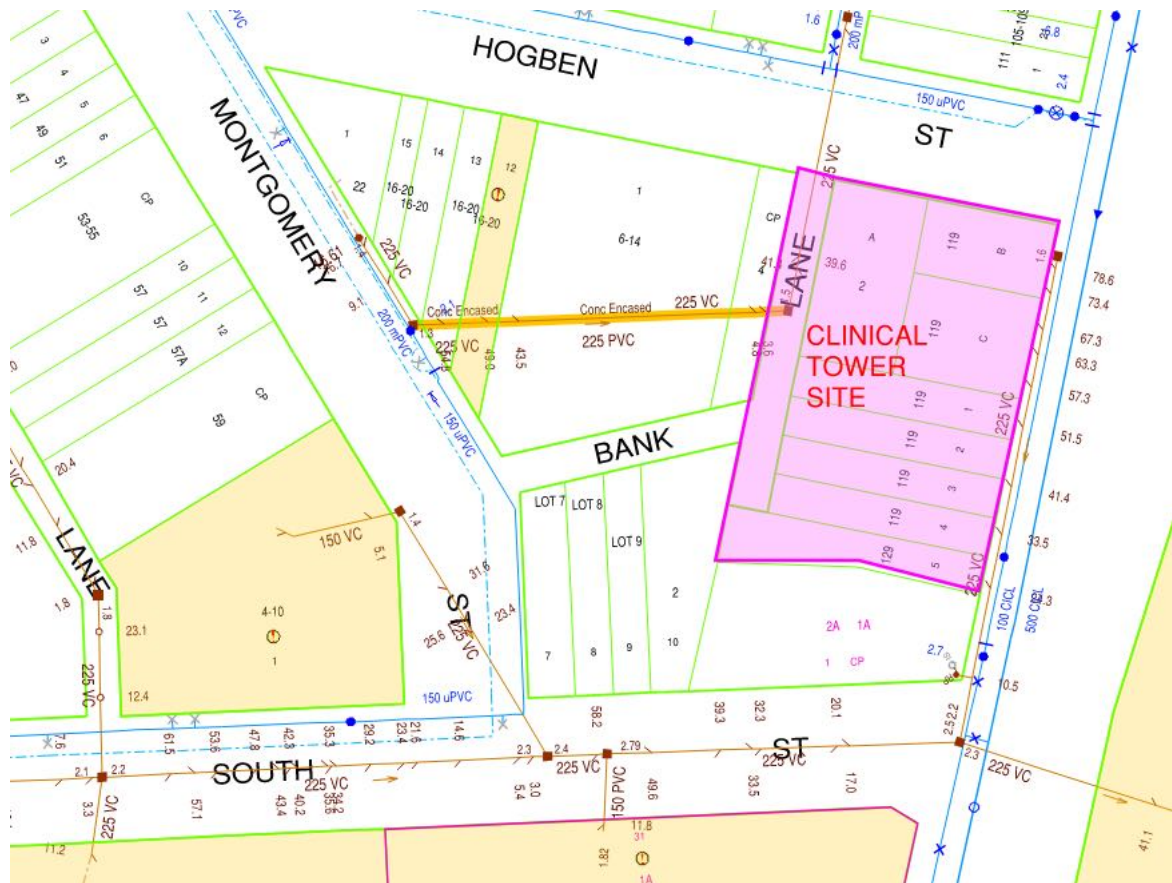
(B) Detailed View Sydney water DBYD Plan
